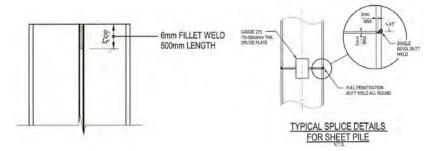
Sheet pile wall top & typical splice detail for sheet pile
